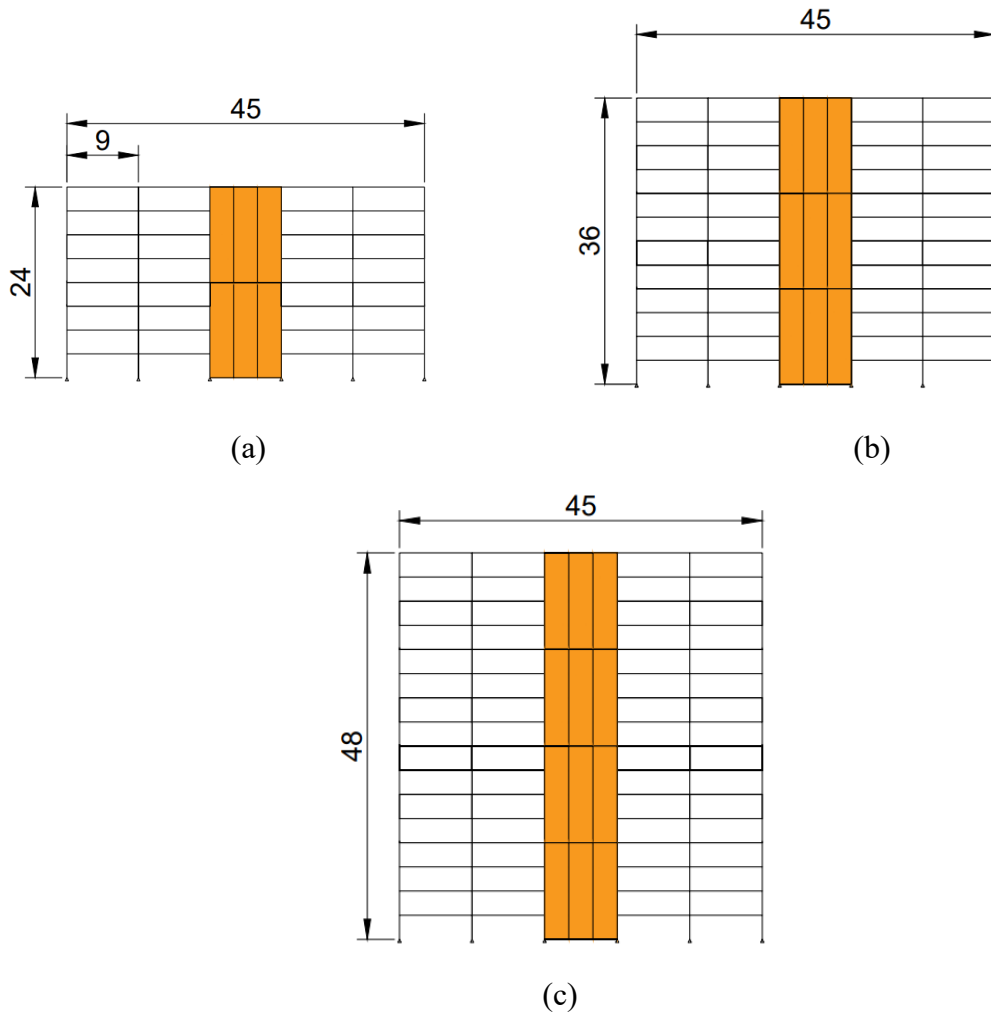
Vertical Elevation: (a) 8-Story, (b) 12-Story, (c) 16-Story
